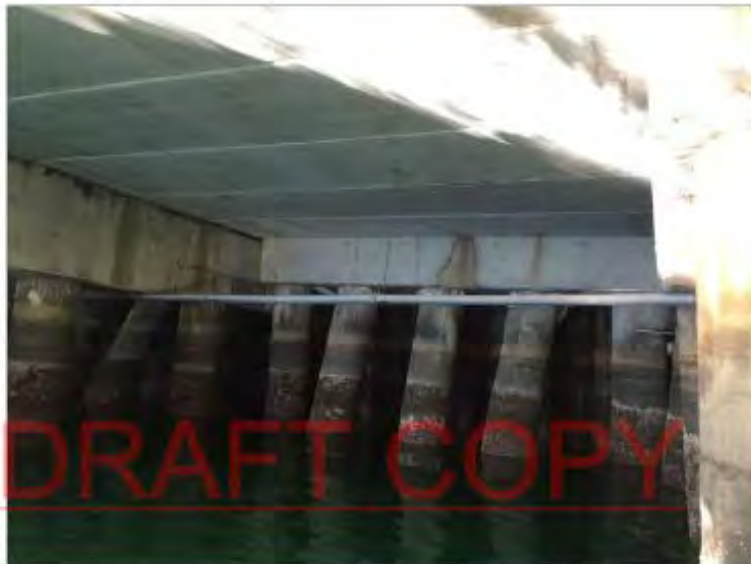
Bent 16 Pile C2 - Bottom of concrete jacket visible
